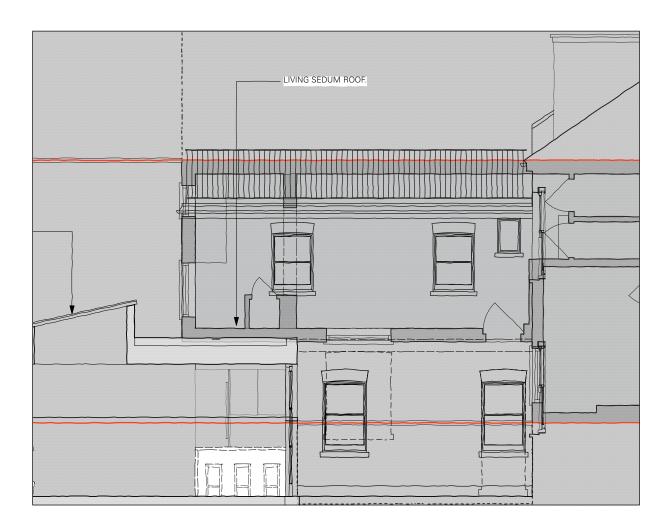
Part elevation/section of side return showing new windows (existing removed shown dashed) - 2019.
